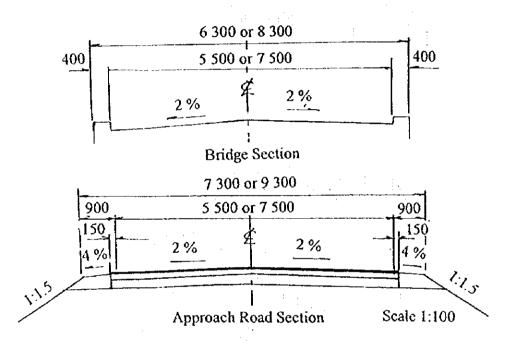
2 Typical Cross Section of Proposed Bridge and Approach Road
